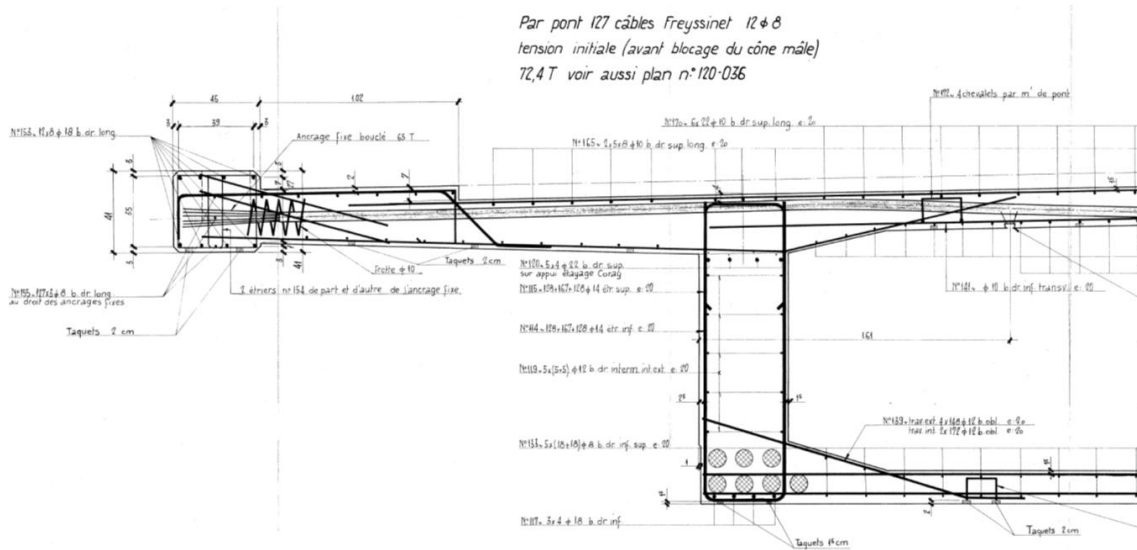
Transverse section of reinforcement at mid-span (Zoom of left hand side).
